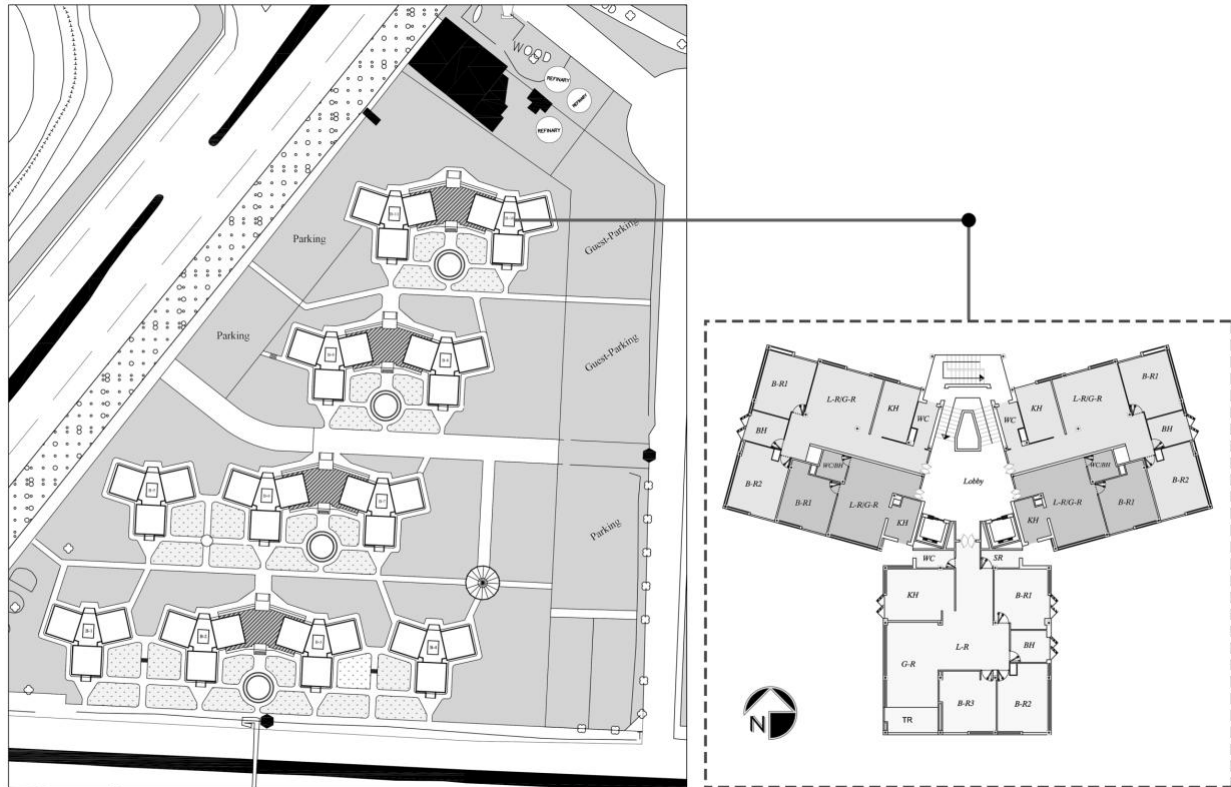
High-rise apartment complex site plan and current plan of the blocks.
